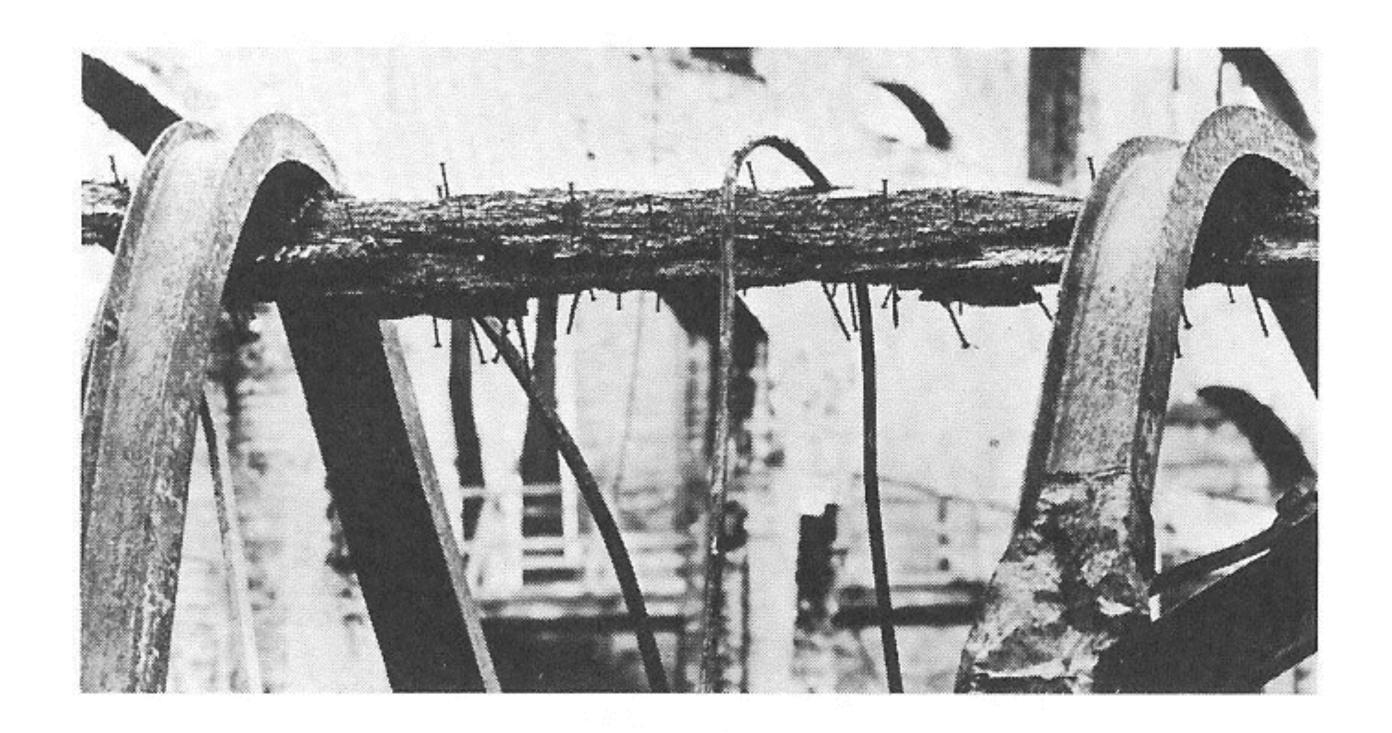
After fire scene. Shows a wood beam supporting twisted steel I-beams. (Forest Products Laboratory)
